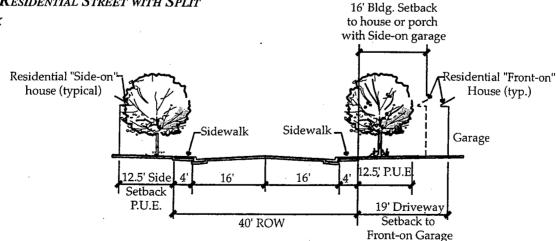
Note: Sidewalks shall be 6' wide adjacent to parks and 8' wide adjacent to schools. MINOR RESIDENTIAL STREET
